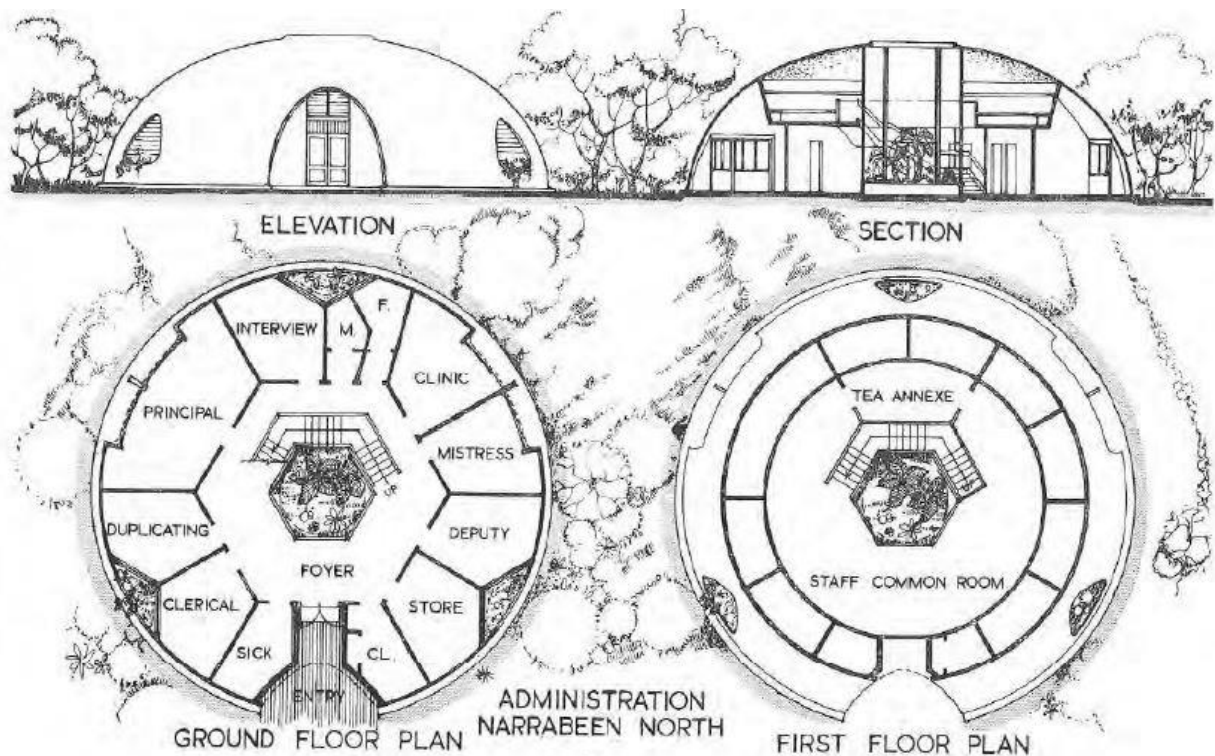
PLANS AND ELEVATIONS FOR THE ADMINISTRATION BUILDING, NARRABEEN NORTH PUBLIC SCHOOL (BINISHELL A).
